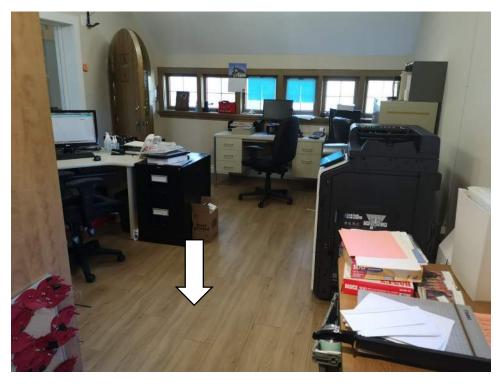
00 00.02 - Interior Finishes and Furnishings - Laminate Floor / Original Church
